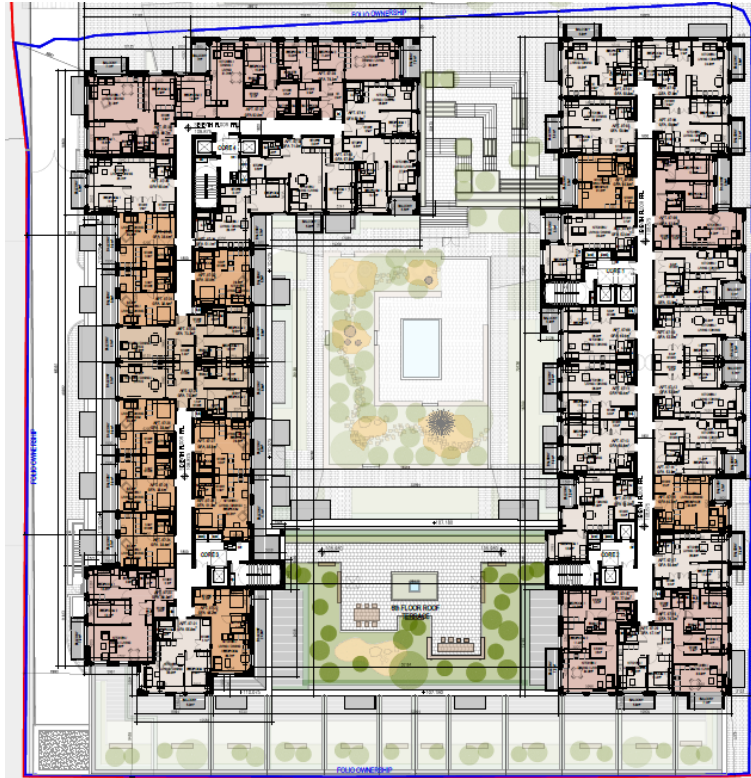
Seventh floor plan. 11 no. studio apartments, 21 no. one-bedroom apartments and 9 no. two-bedroom apartments are provided at this level.
